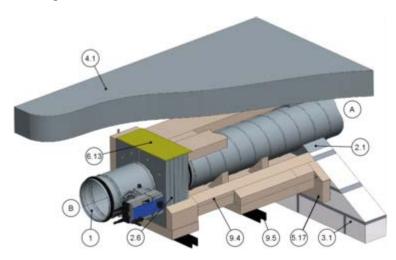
Dry mortarless installation remote from solid walls with installation kit WE2 (wall connection), four-sided cladding
